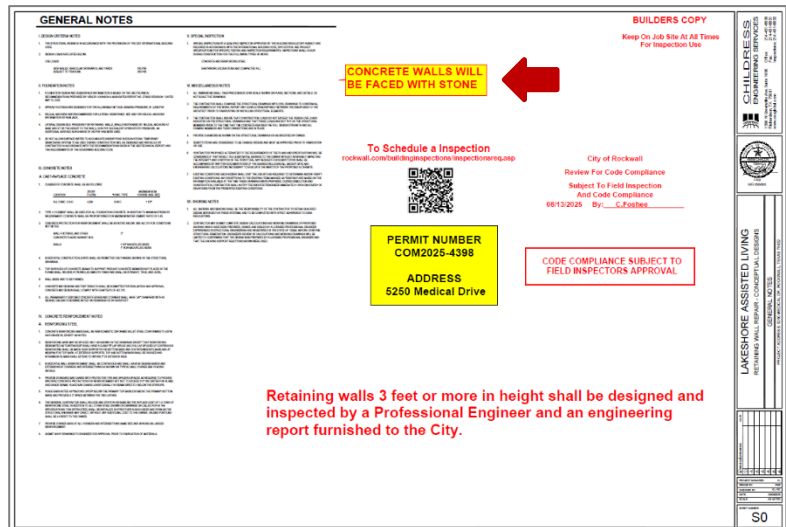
APPROVED PLAN SET SHOWING STAFF'S NOTE (INDICATED BY THE RED ARROW) CONCERNING THE STONE REQUIREMENT.
